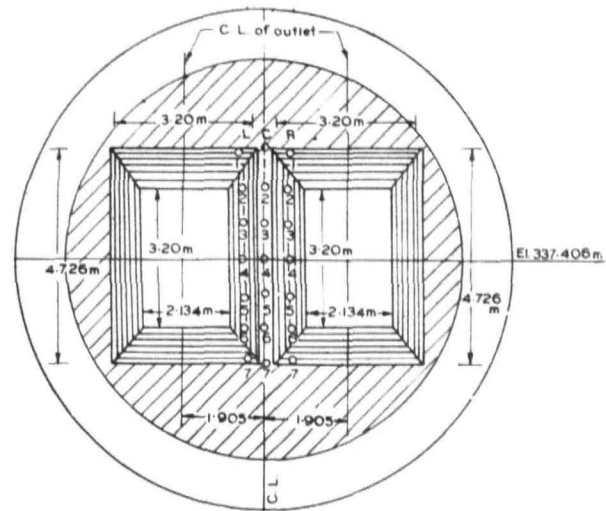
Location of piezometers at the central pier of outlet conduits.
